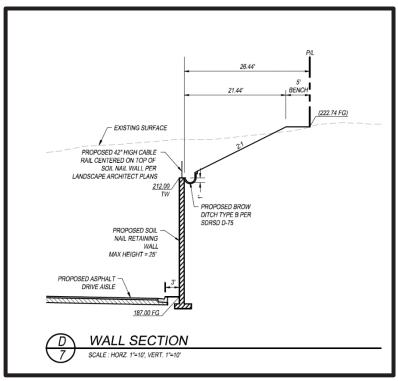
Proposed Retaining Wall Along Northern Property Line Between Parcels 3 and 4
